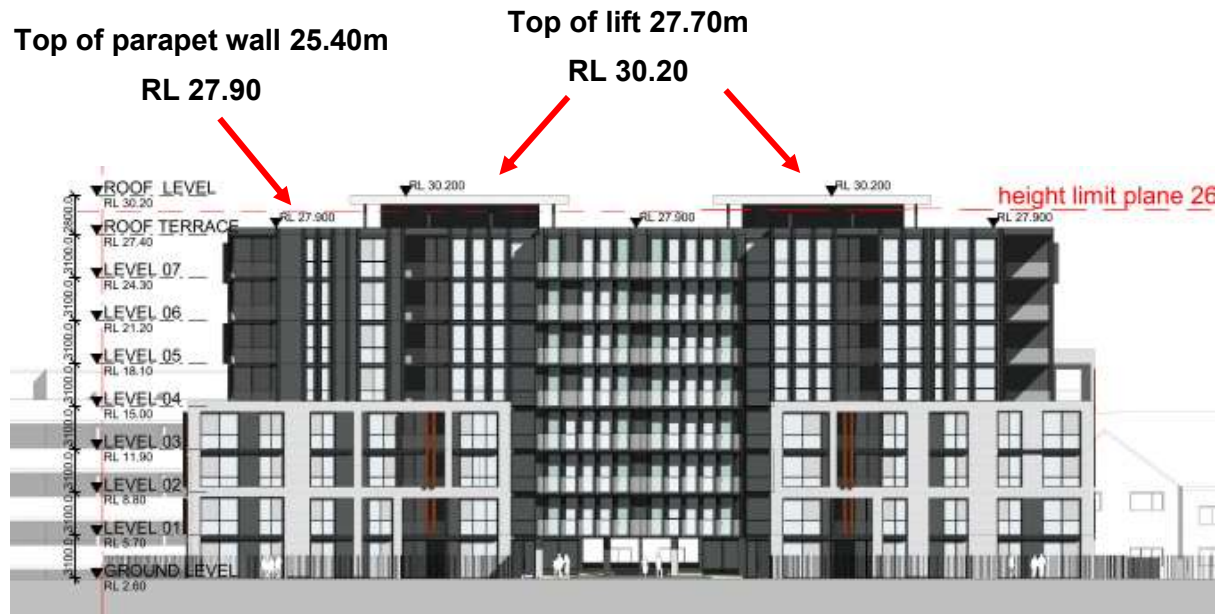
South elevation plan (residential building) showing the height breach at the lift overrun
